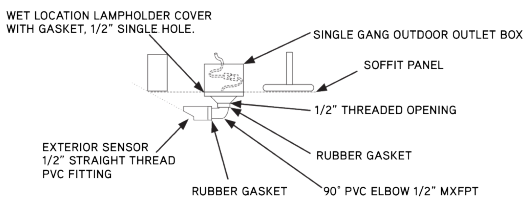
Typical Horizontal Exterior Sensor Wall Mounting Detail (Side View)
